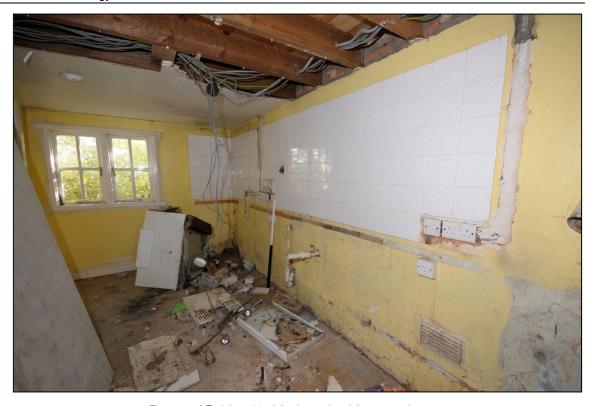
No. 41, kitchen, looking south-east (Scale 1m)
